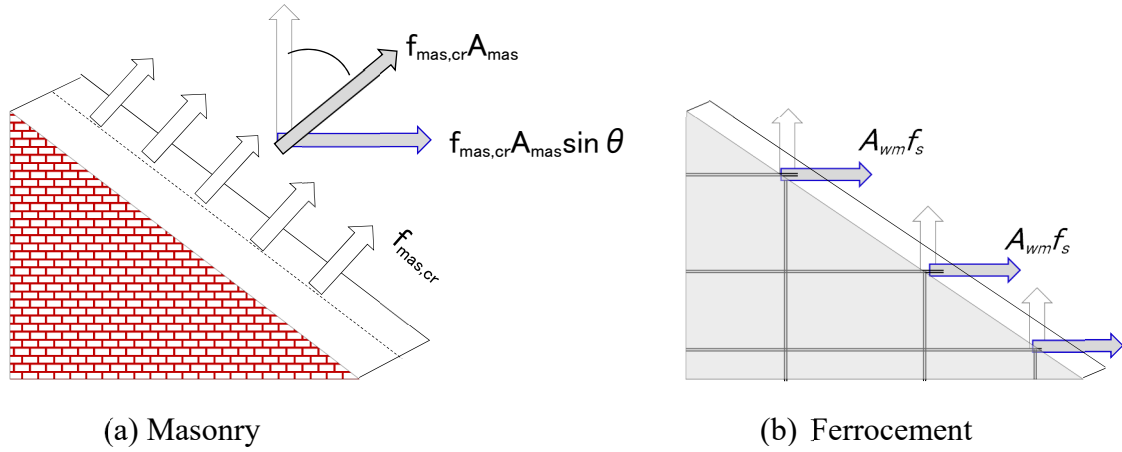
a) masonry infill, and b) ferrocement layer at diagonal cracking
